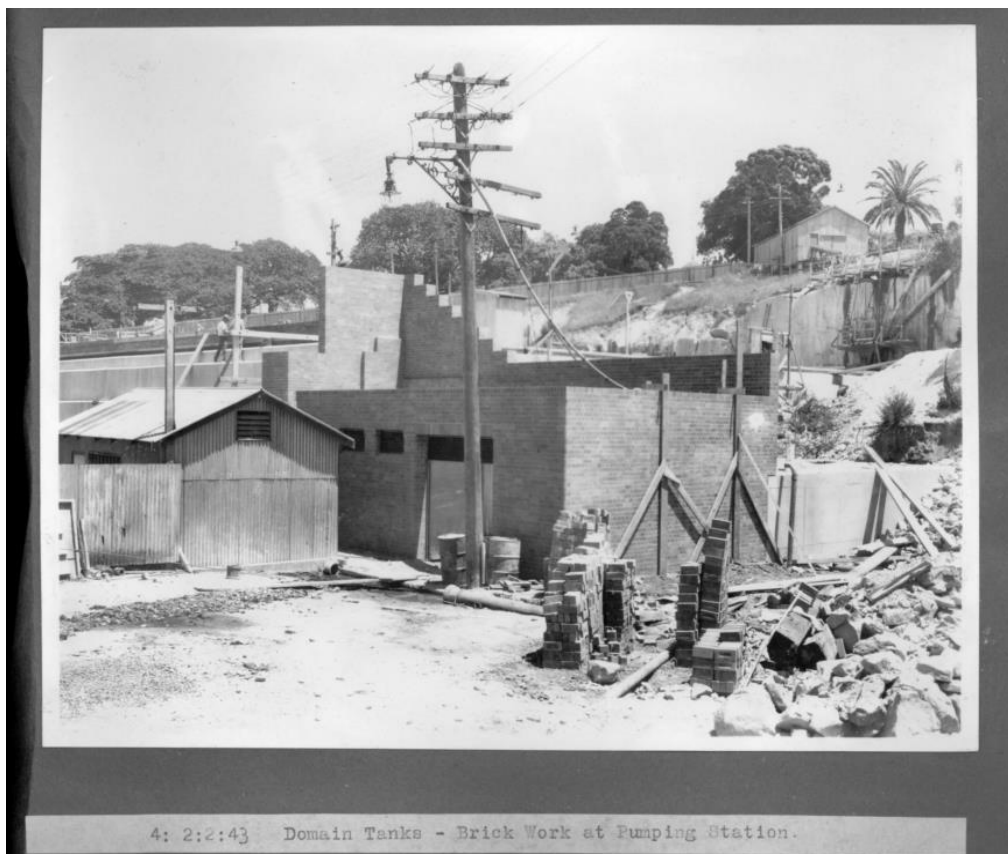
Pumping station under construction, dated 1943. (Source: Sydney Water Archives)
